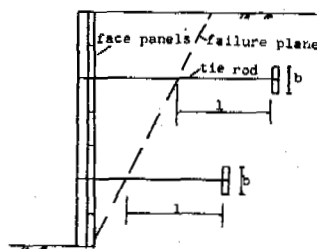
Schematic Diagram of the Retaining wall with Anchor Slabs
